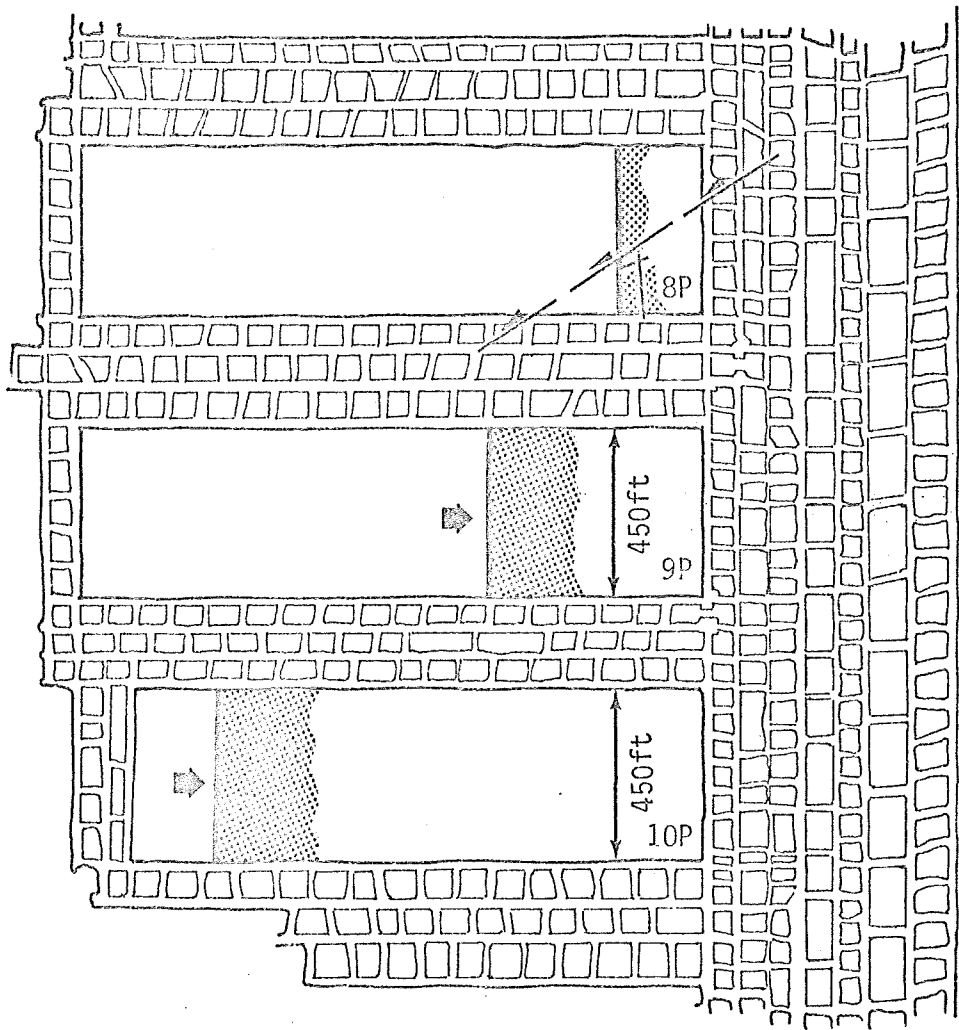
Longwall Panel Layout; Allen Mine, 9th & 10th Panel
